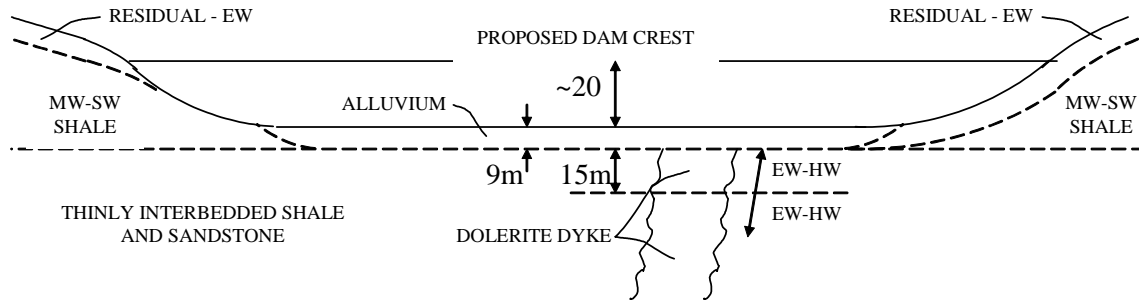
Simplified longitudinal section of proposed dam and types of soil and rock underlying it
